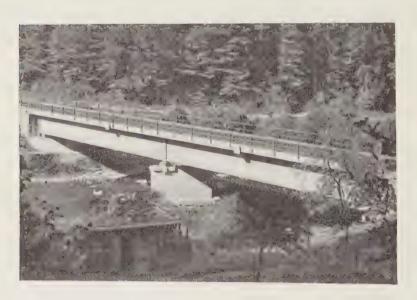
Swiss Federal Railways: Railway bridge Bärschwil, mixed steel and concrete construction, continuous L-type girder = 2×66 ft.
